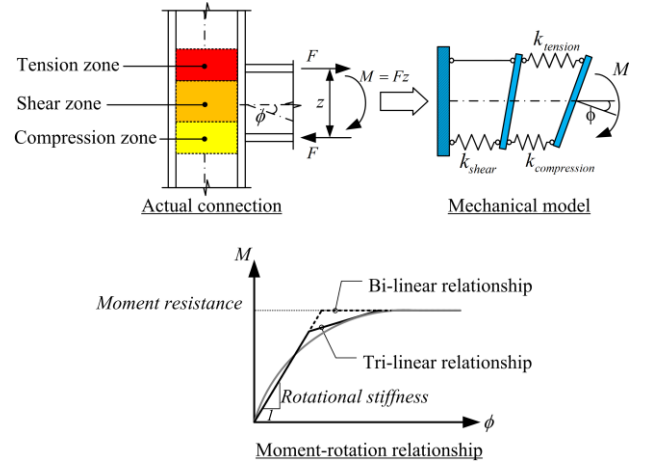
Systematic model of beam-to-column connection according to Eurocode 3
